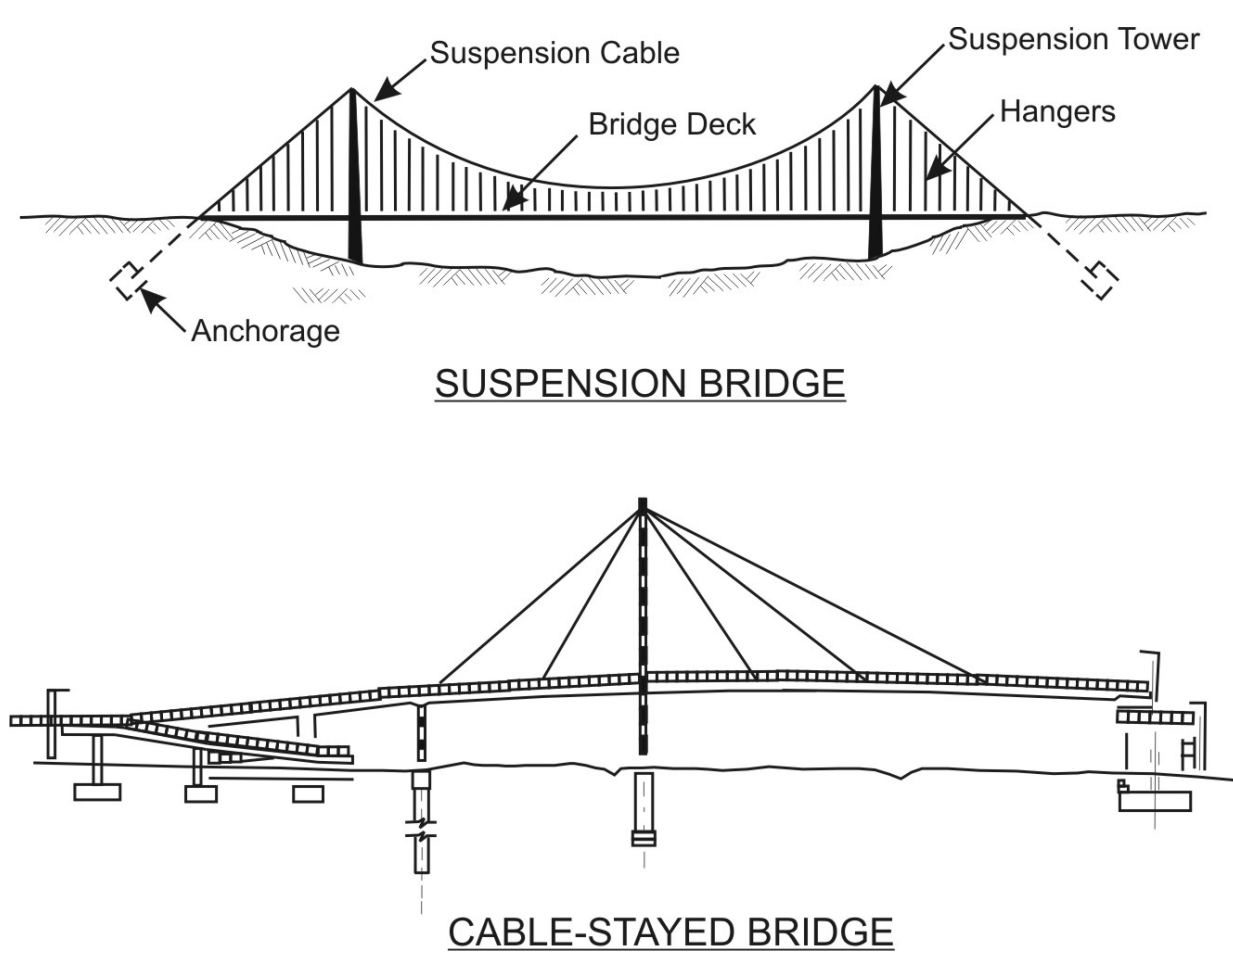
(c) Suspension Bridge & Cable Stayed Bridge
